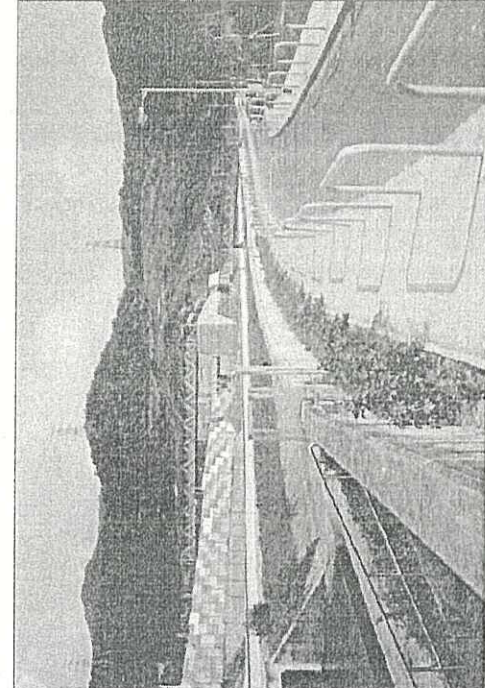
chiller system at the vent building of the Tai Lam Tunnel north portal
